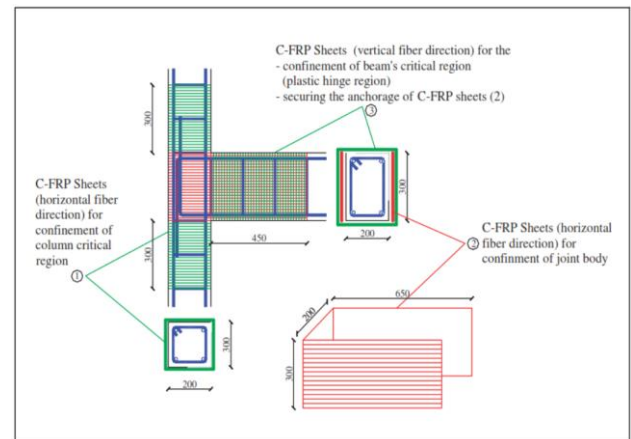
Details of the specimen: Reinforcement, dimensions, and arrangement of FRP [10], all dimensions in mm.
